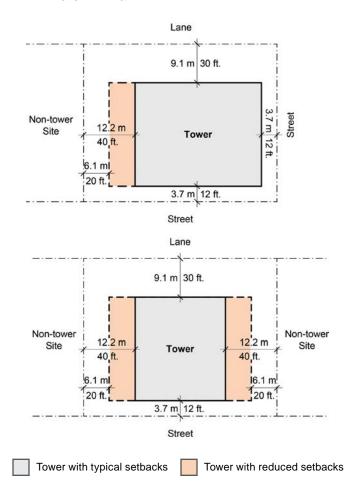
Plan diagrams illustrating tower setbacks and supported reductions on a corner site (top) and mid-block site (bottom).
